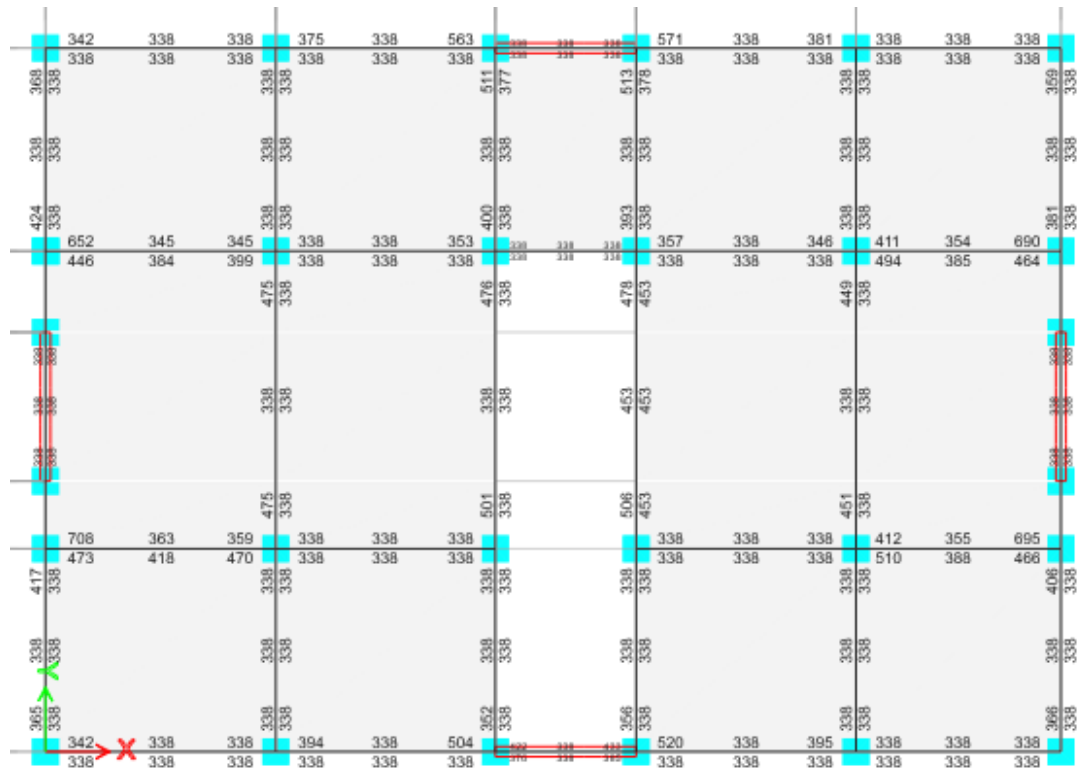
Cross-Sectional Area of Steel Bars for the Same Floor Beams Shown in Figure 14 for Conventional Case.
